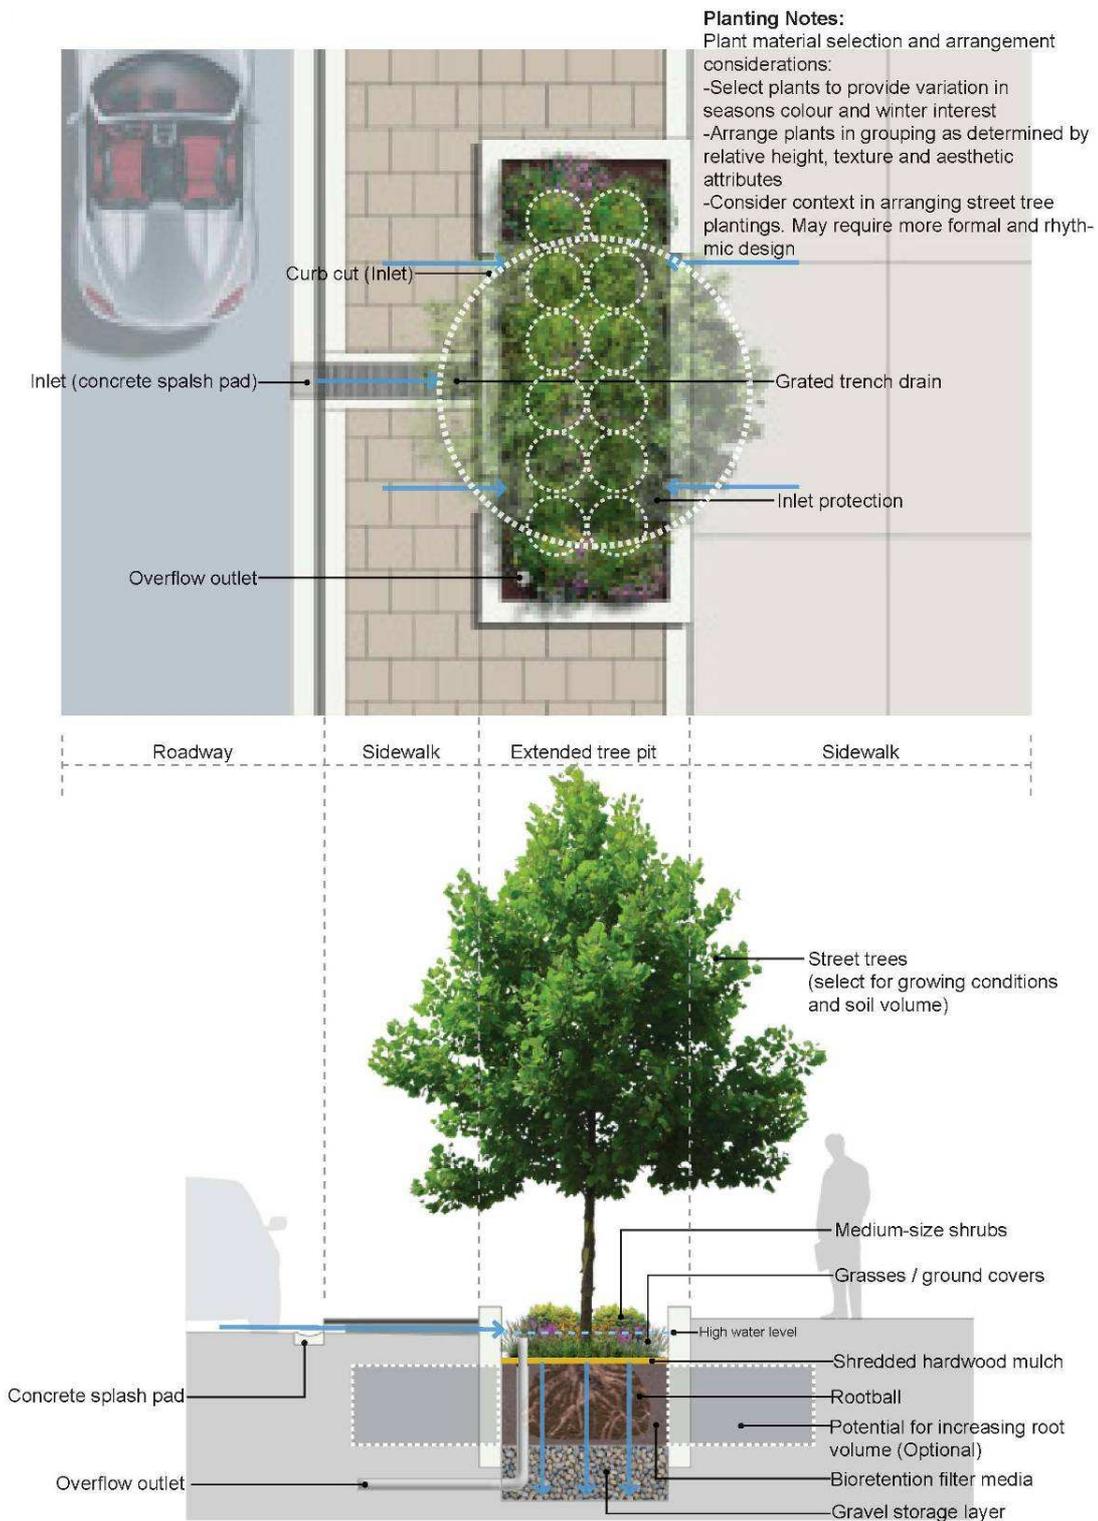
Extended tree pit plan view and cross-section; sizing and layout guidance is provided in the LID Stormwater Management Planning and Design Guide.
